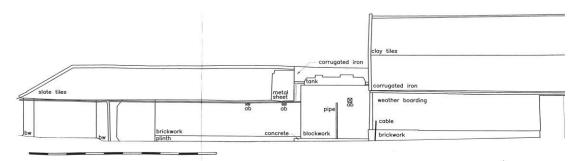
Northern external elevation of the enclosed shed (1) and the corner shed (2)
